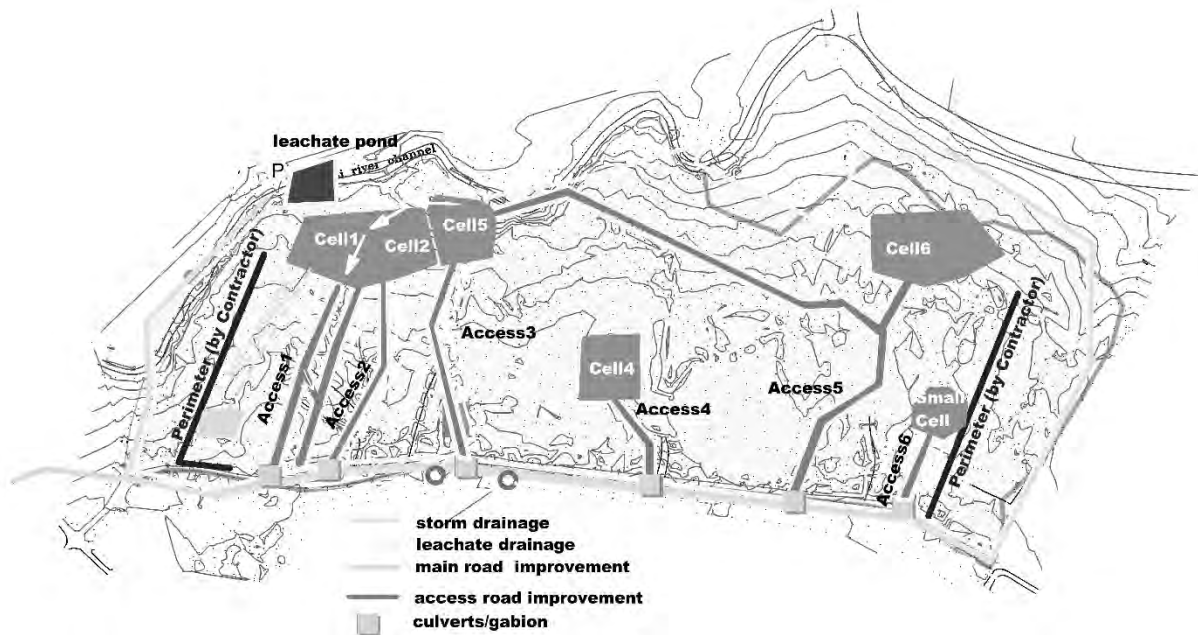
Layout Plan of Dandora Dumpsite in Phase 2
